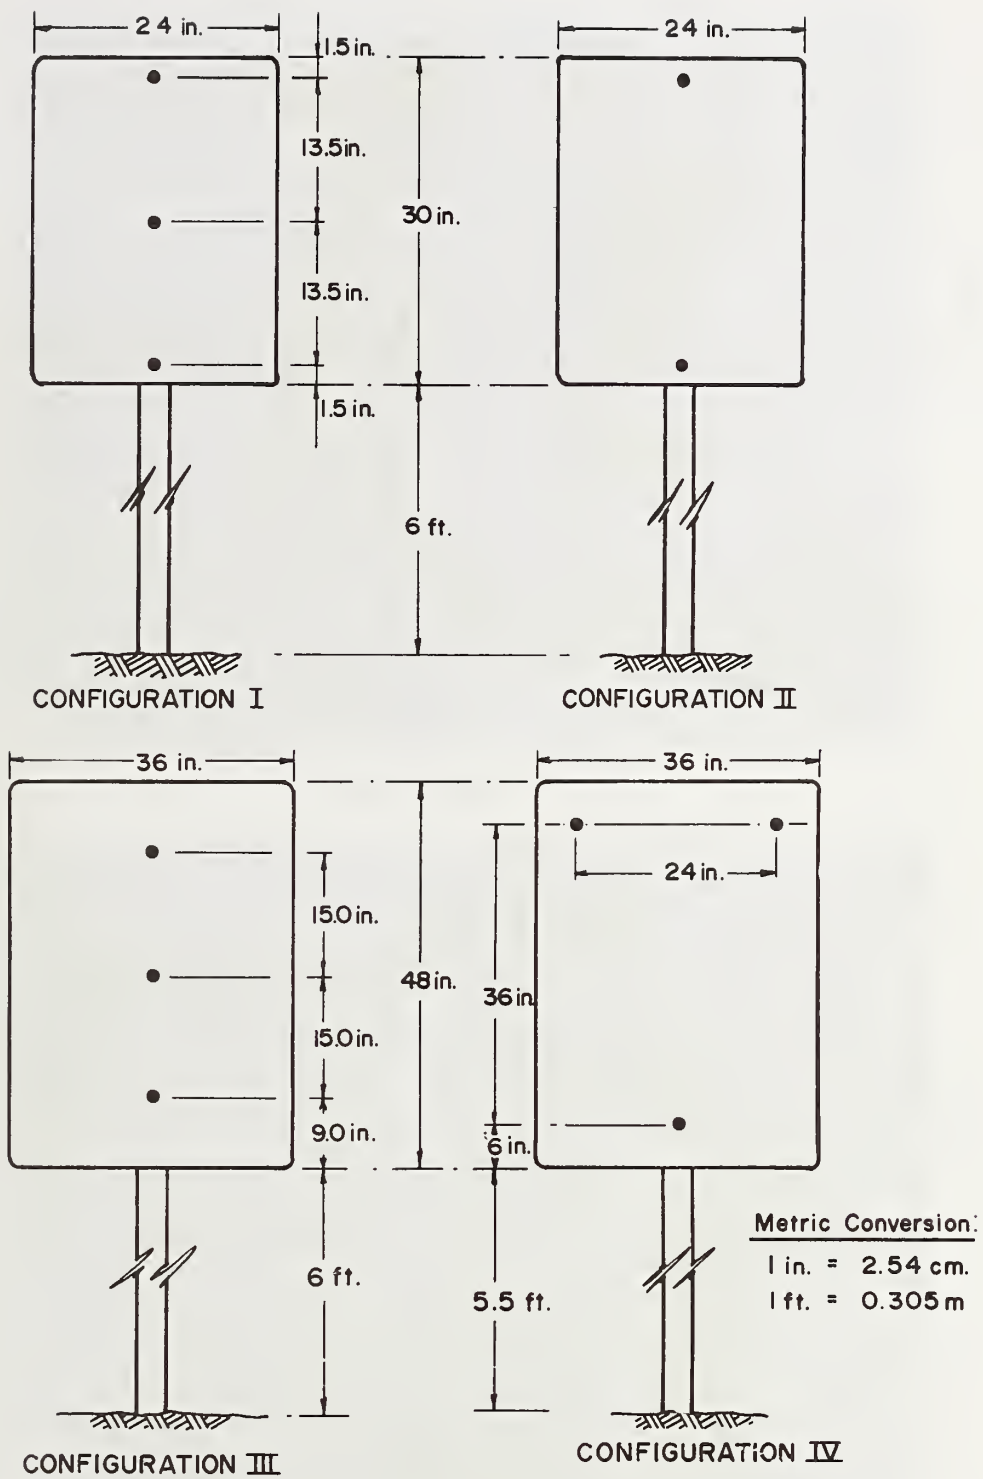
PANEL SIZE AND FASTENER DETAILS.
